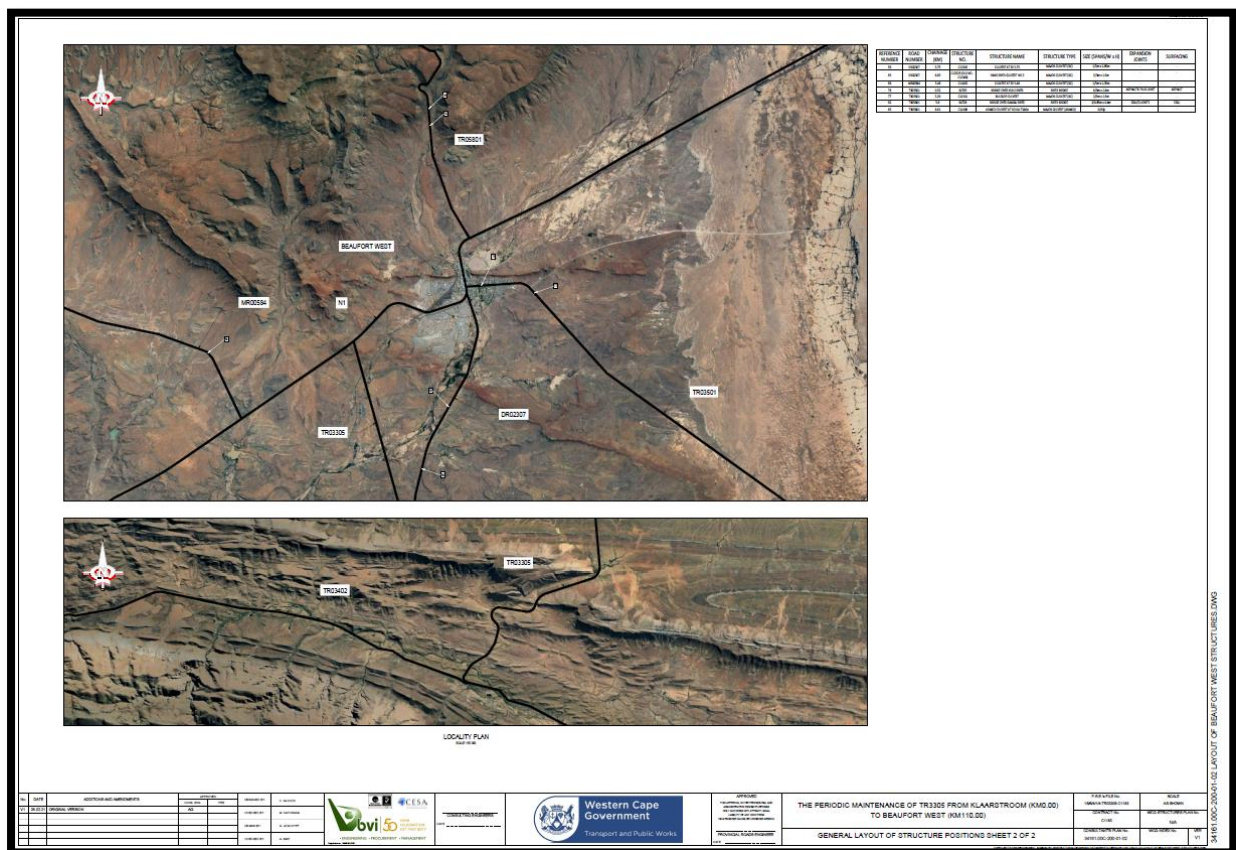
Figure showing bridge and culvert positions (Chameleon).
